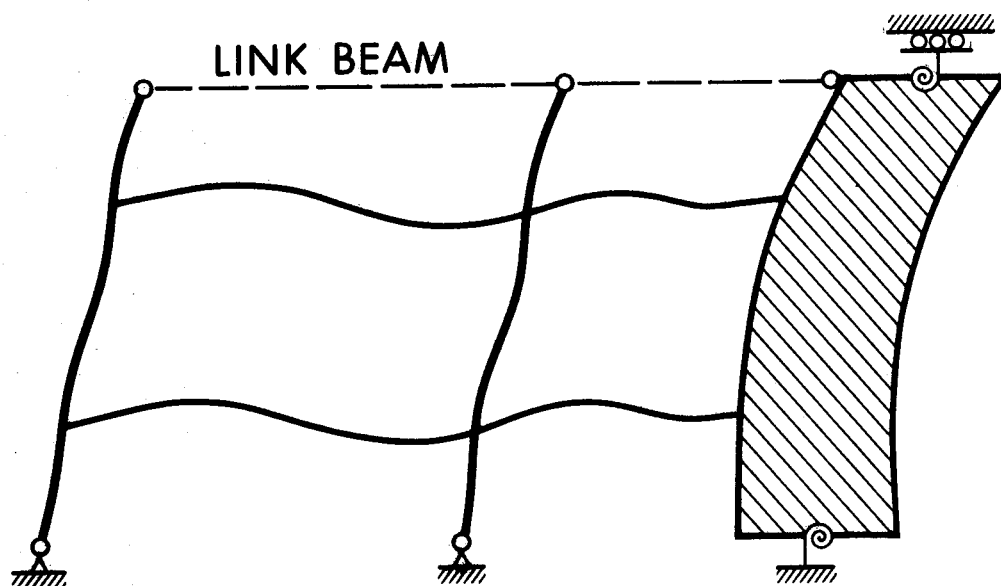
SLICE OF A FRAME-SHEAR WALL STRUCTURE
